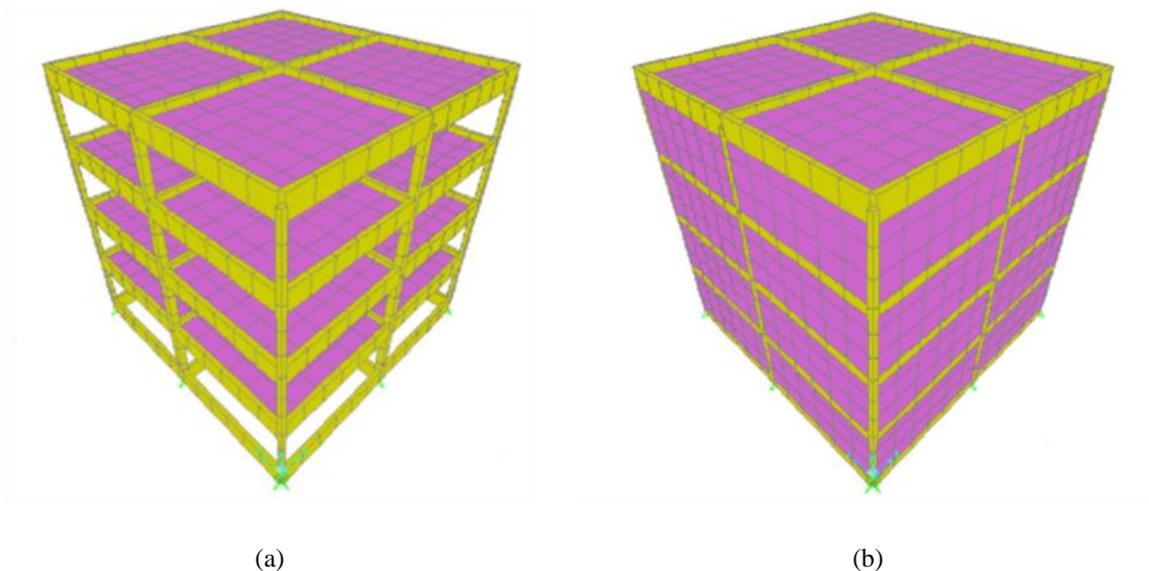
(a) Three-dimensional model of the building without discretized masonry walls (masonry walls incorporated as distributed load) and (b) Model with discretized masonry walls
